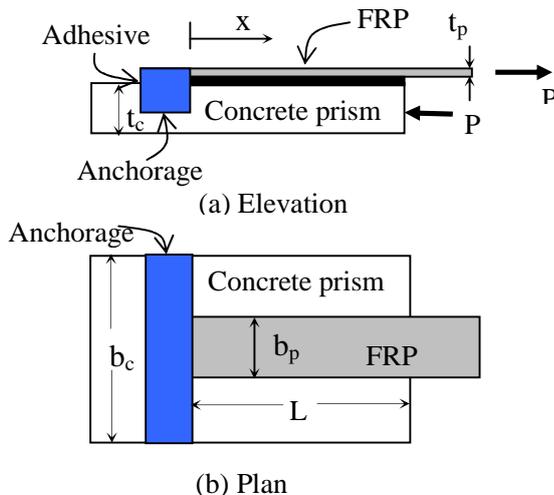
Pull-push shear test of a single-lap plate-to-concrete bonded joints with end anchorage
